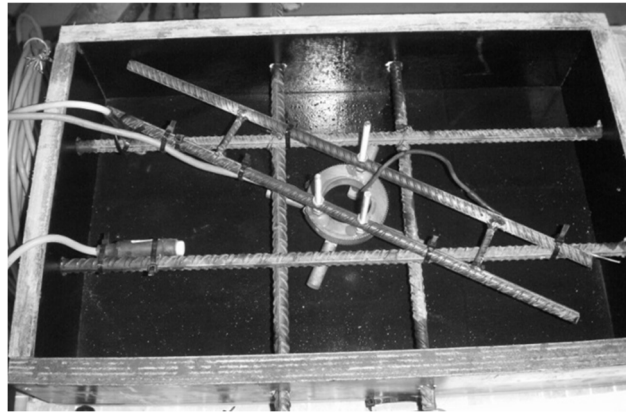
CKS installed on the reinforcement concrete specimen panel.
